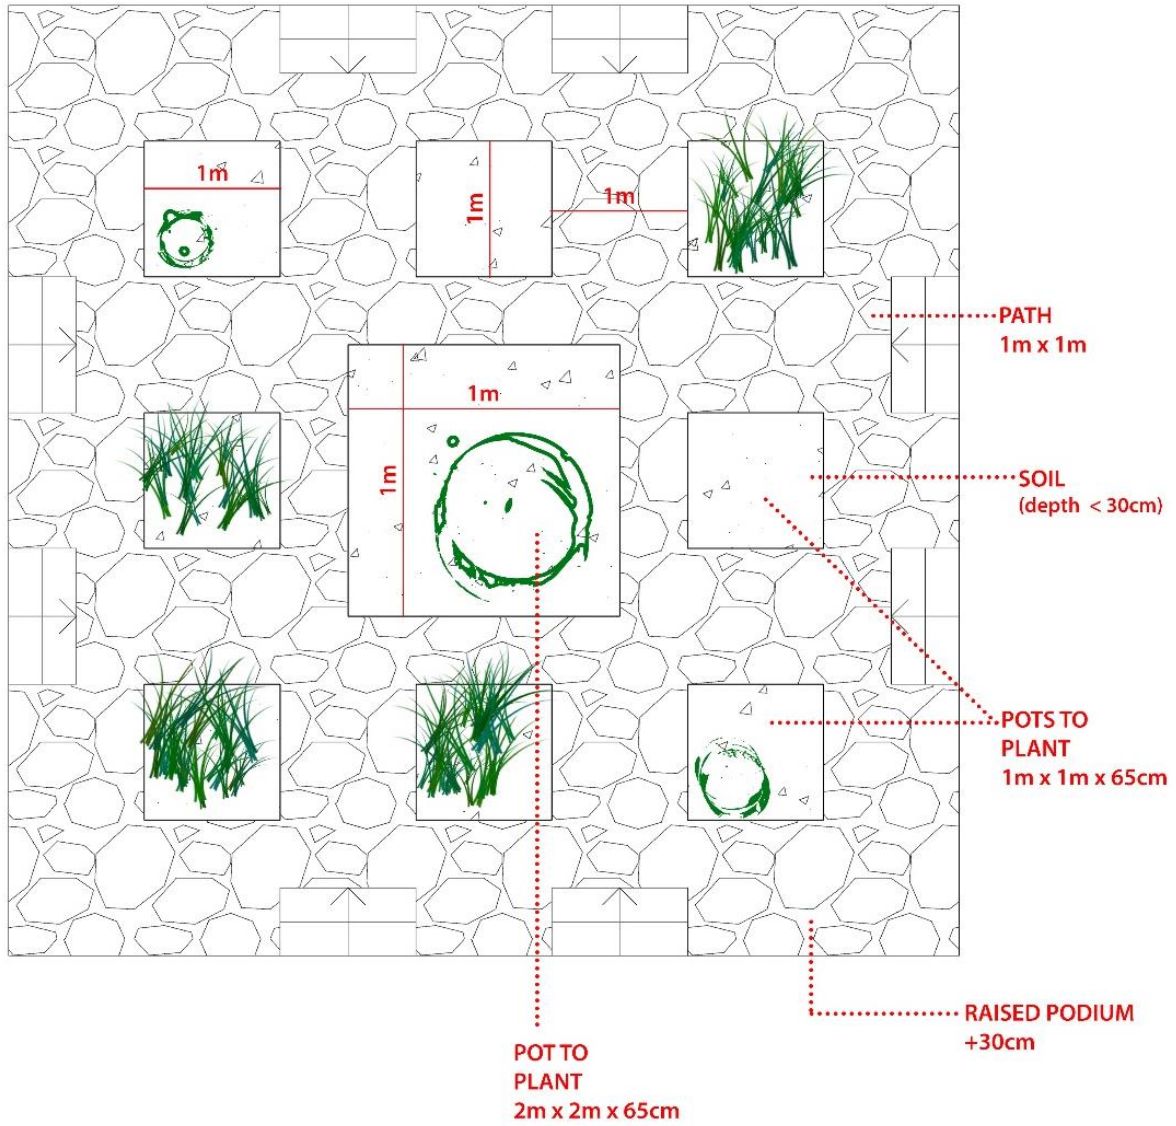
Module System for intensive green roof - plan (Prepared by: author)
